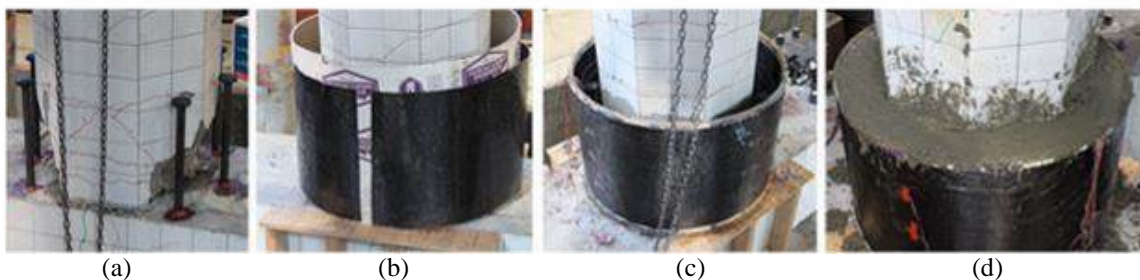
Repair procedure: (a) post installed headed bars; (b) split CFRP shell; (c) CFRP shell around column; (d) CFRP shell filled with nonshrink or expansive concrete.
